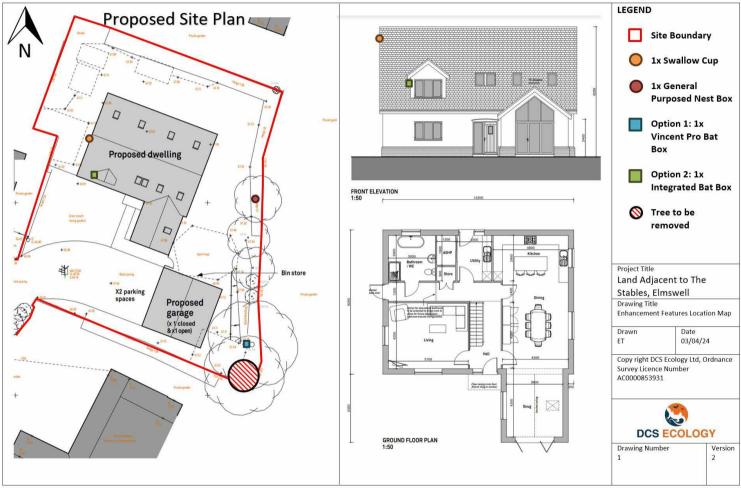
Enhancement features map. U sing plans produced by Patrick Allen & Associates Architects.
